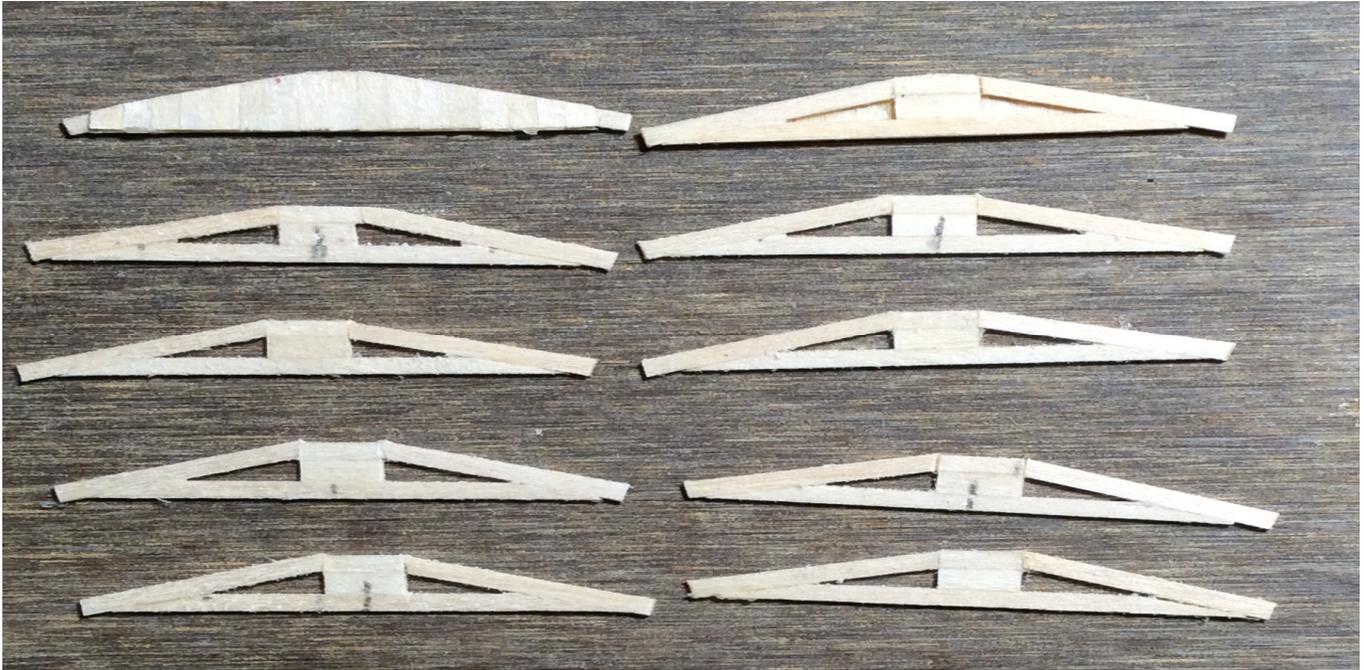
Roof trusses. Exterior paneling shown on the top two trusses
